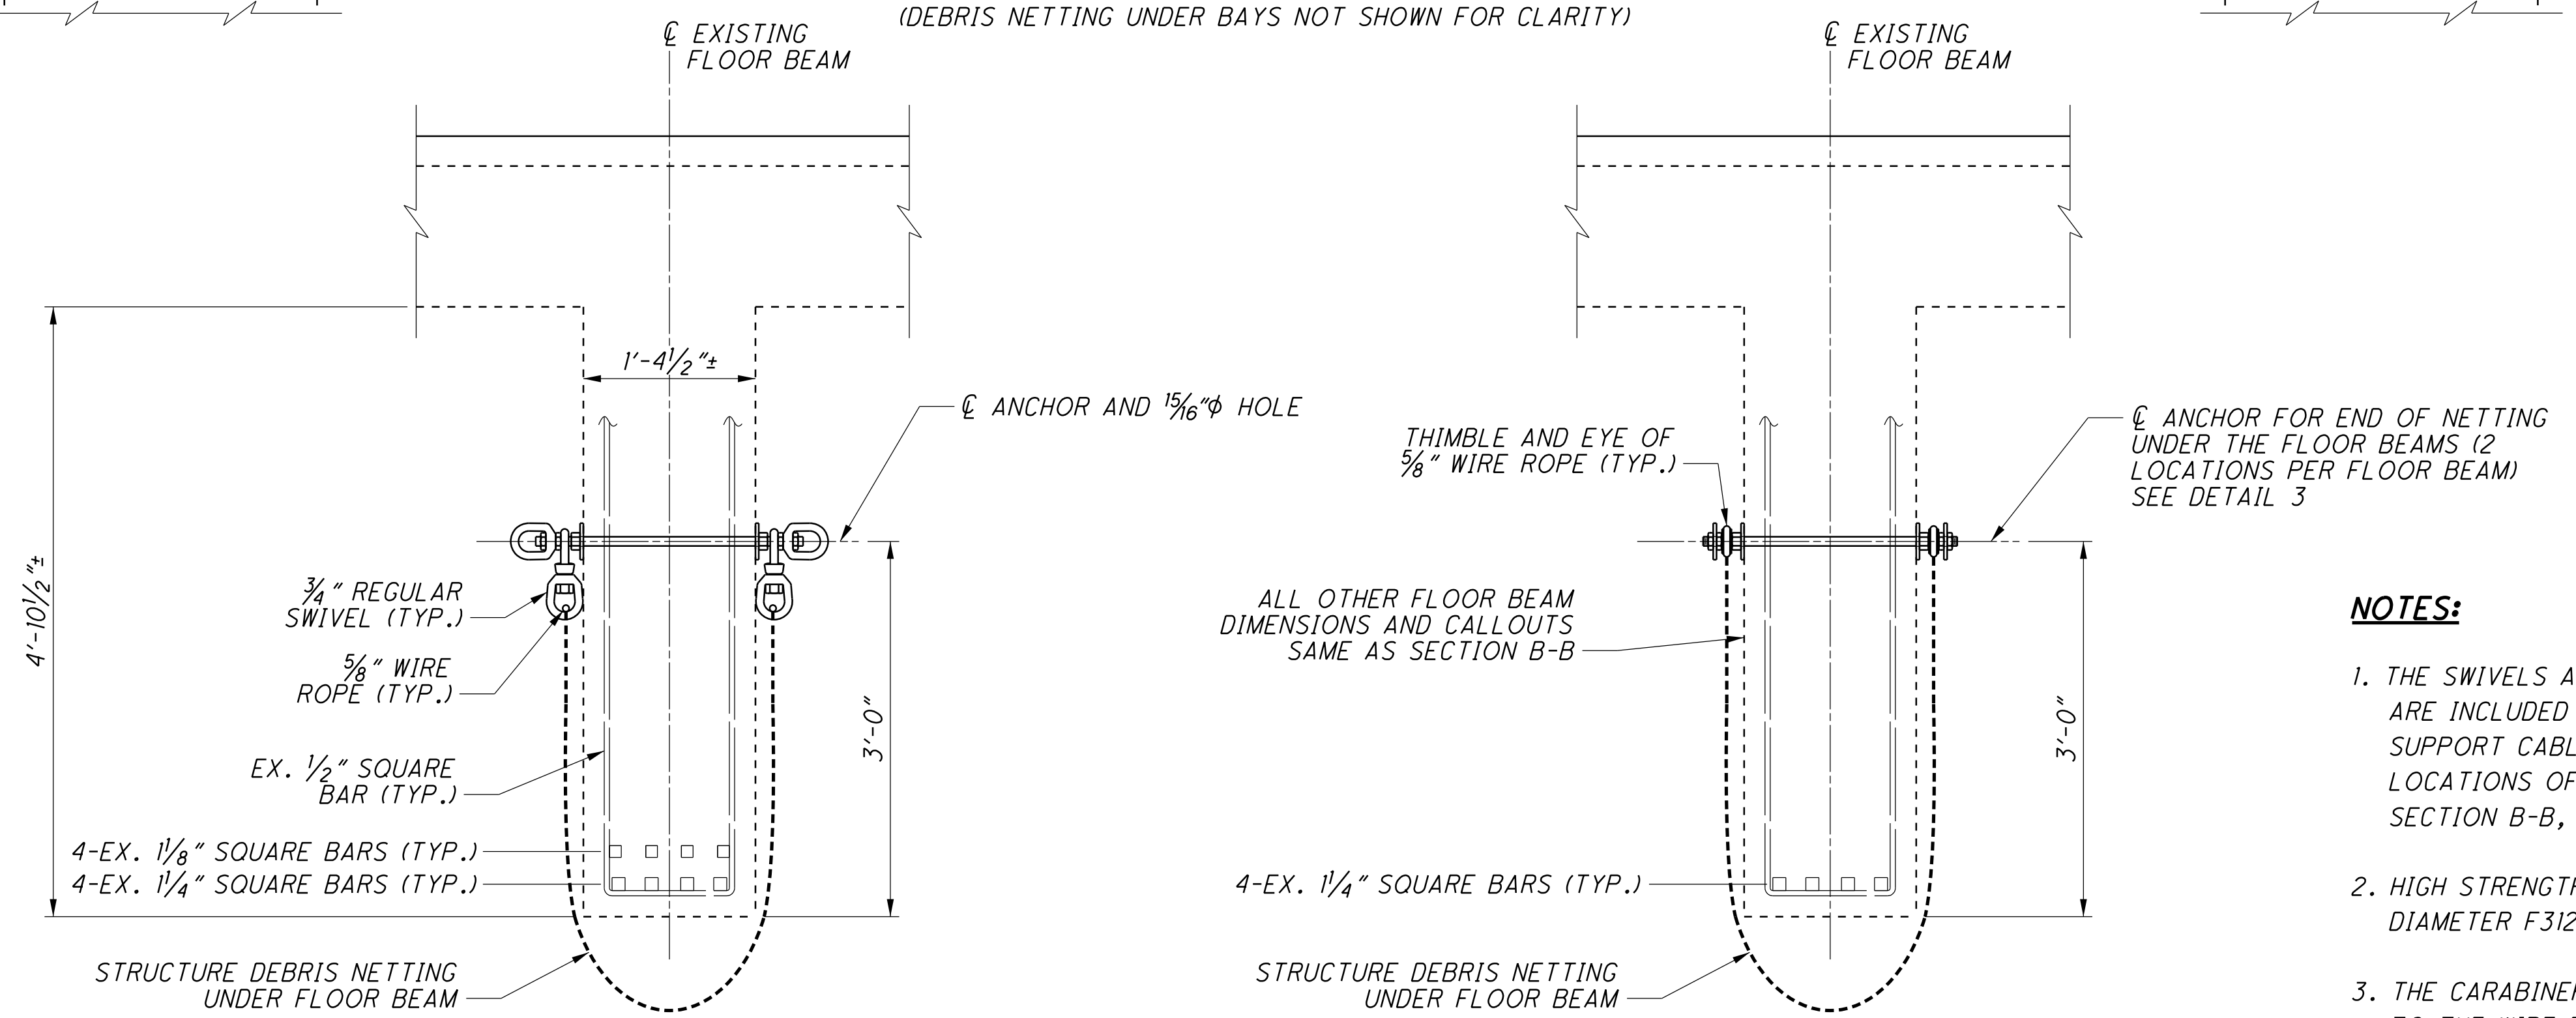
TERMINAL ANCHOR DETAIL 2 - CONTINUOUS ANCHOR DETAIL 3 - ANCHOR AT FLOOR BEAM ENDS
